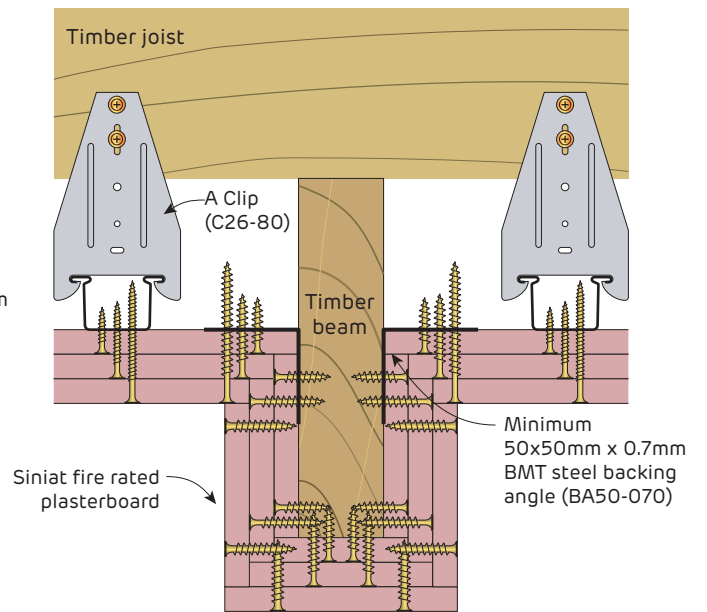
3 Sided Protection for Timber Beam to Ceiling
